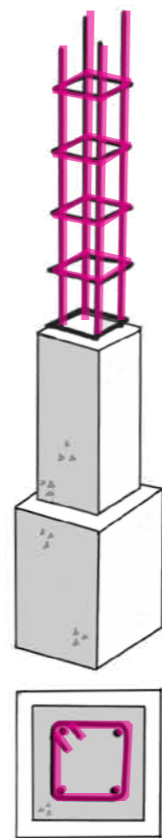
Sloped footing with reinforced concrete column with minimum 4 steel bars.
